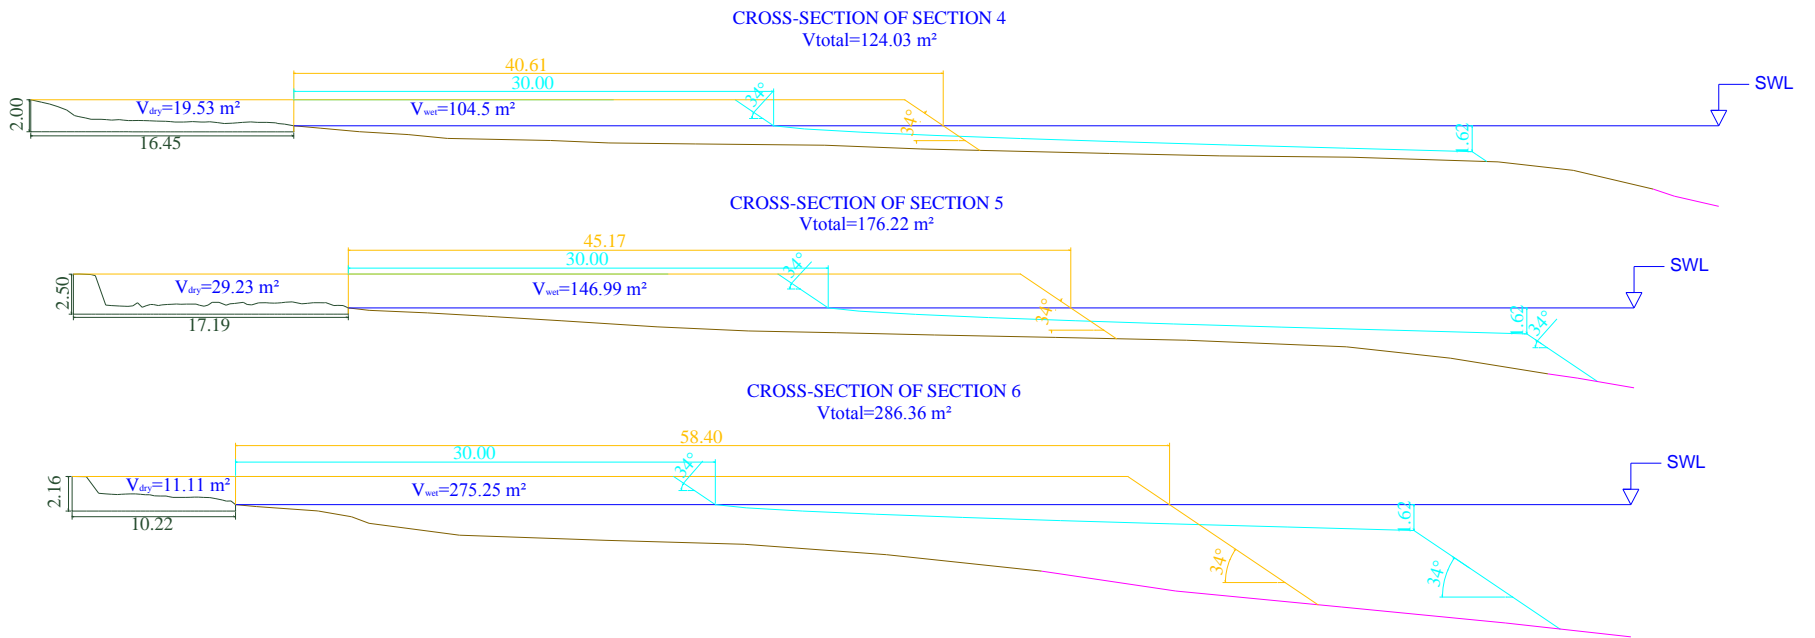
Design profiles of Section 4,5 and 6 for 30 m new dry beach width ($D_{\text{fill}}=0.32 \text{ mm}$).
